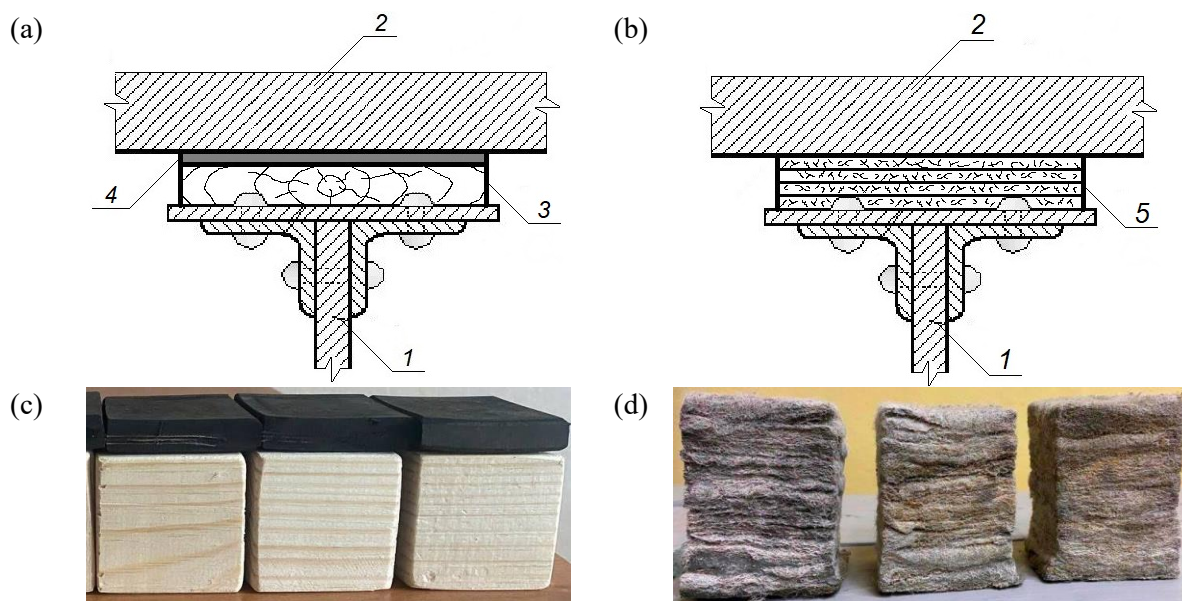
The interlayer between steel bridge girder and reinforced concrete slab: a, b – construction diagrams; c, d – laboratory samples of rubber-wood (a, b) and composite (c, d) interlayer: 1 – steel bridge beam; 2 – reinforced concrete slab; 3 – wooden board; 4 – reinforced rubber; 5 – layers of composite material
